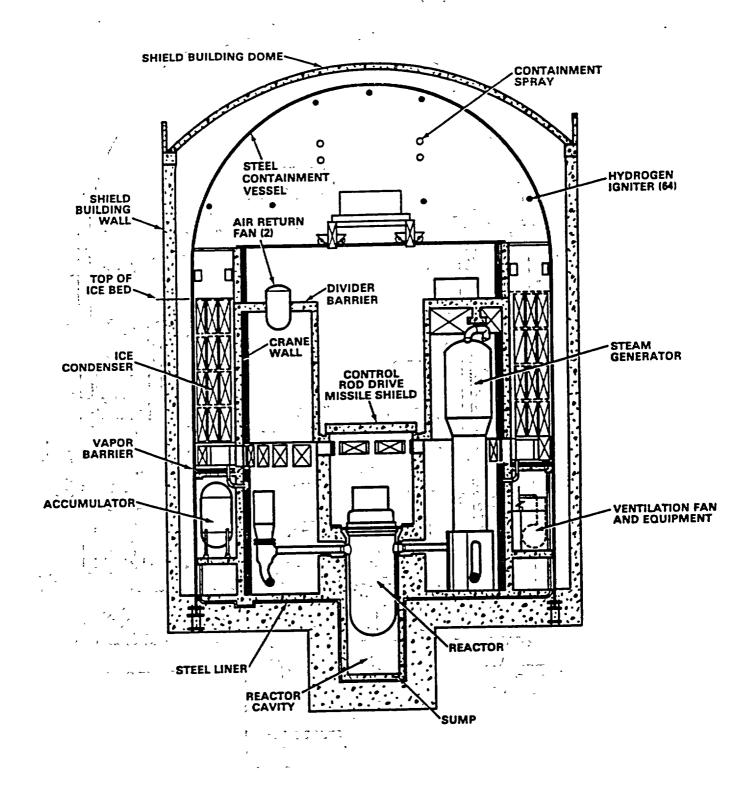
Sequoyah Ice Condenser Containment (Steel Cylinder with Concrete Shield Building)
